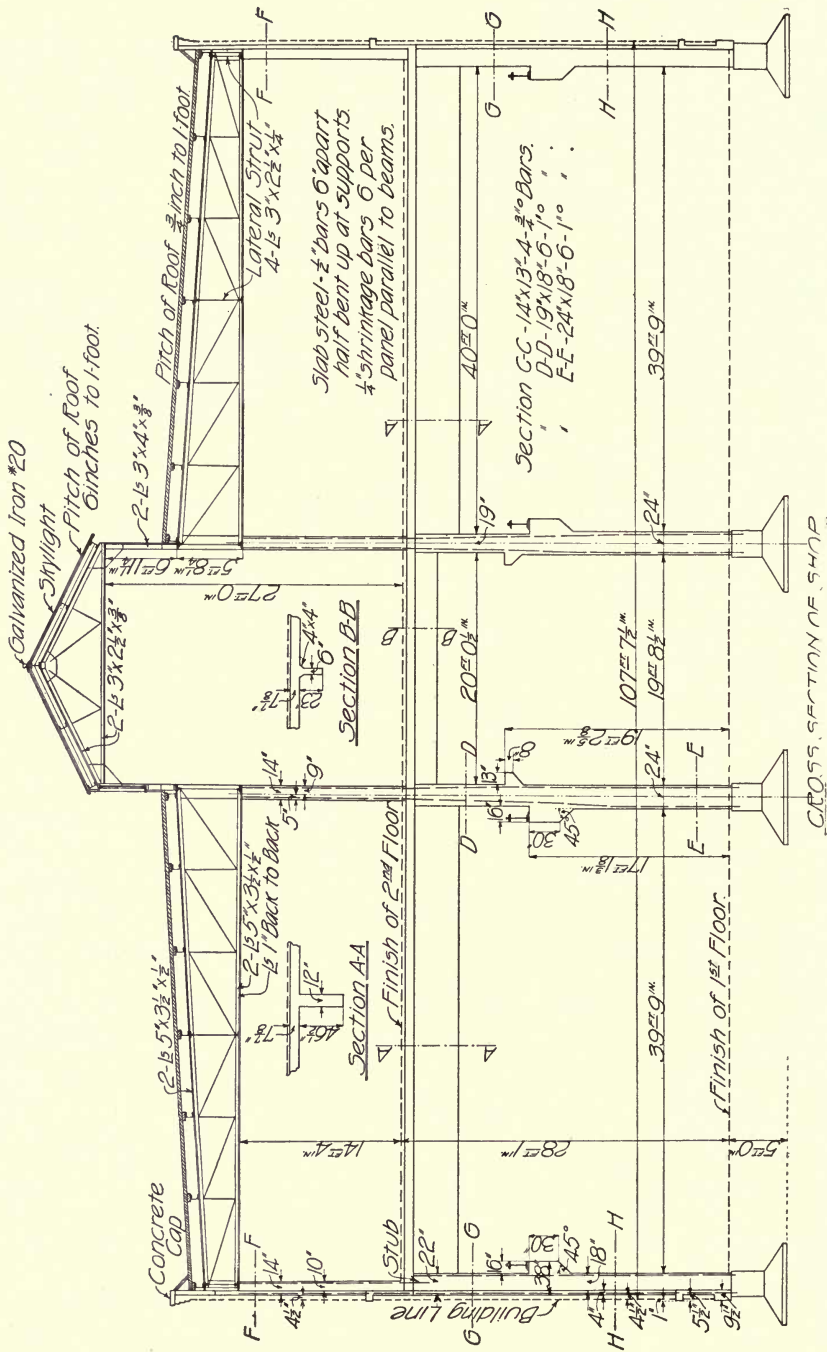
Cross-Section of the Bullock Machine Shop. (See p. 89.)
